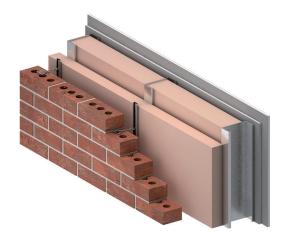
Typical example of warm frame construction (Image courtesy of BW Industries)
